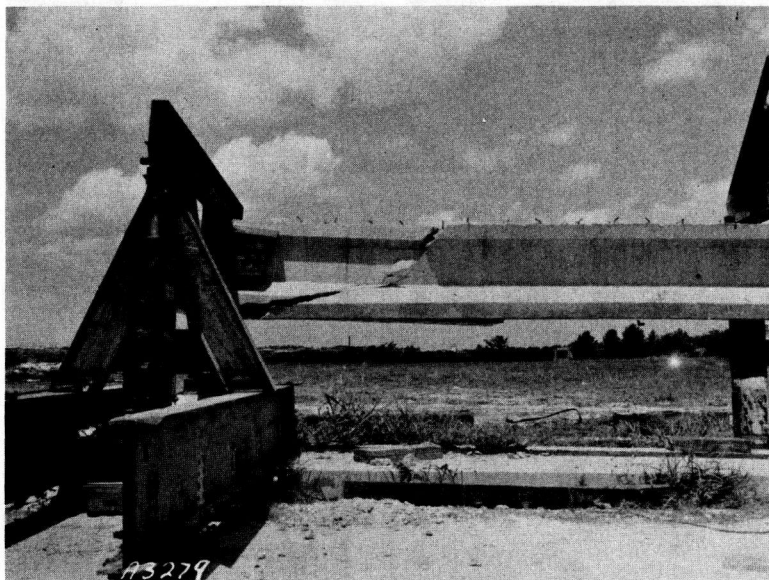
Beam failure, torsion test, pretensioned beam.
